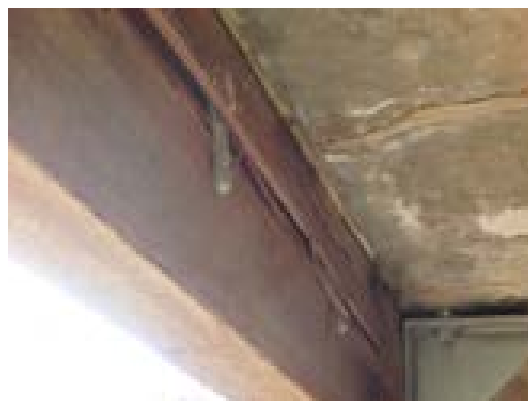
Bridge F-20-L – Curb Bolts Splitting Stringers / Cracked Underside of Deck
